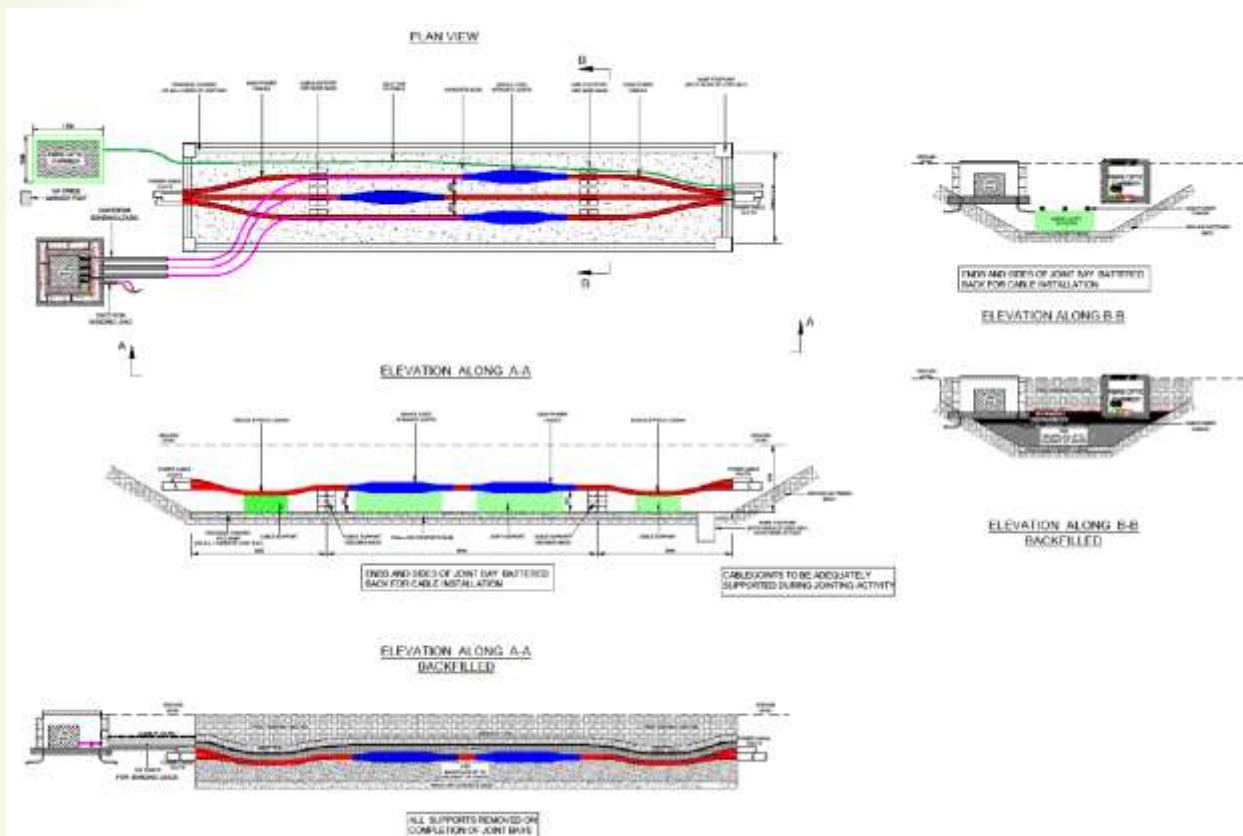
Plan and Cross Section of a Typical Single Circuit Joint Bay
